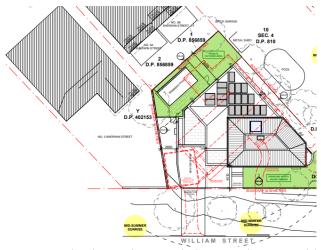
Site Plan showing the proposal relative to 3 Sherwin St and the proposed north-eastern balconies.
